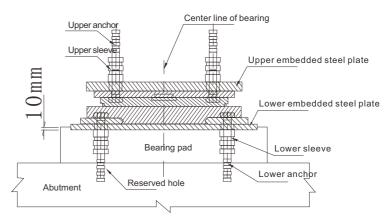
Sketch of the Bearing Body and the Upper Embedded Component Installation
